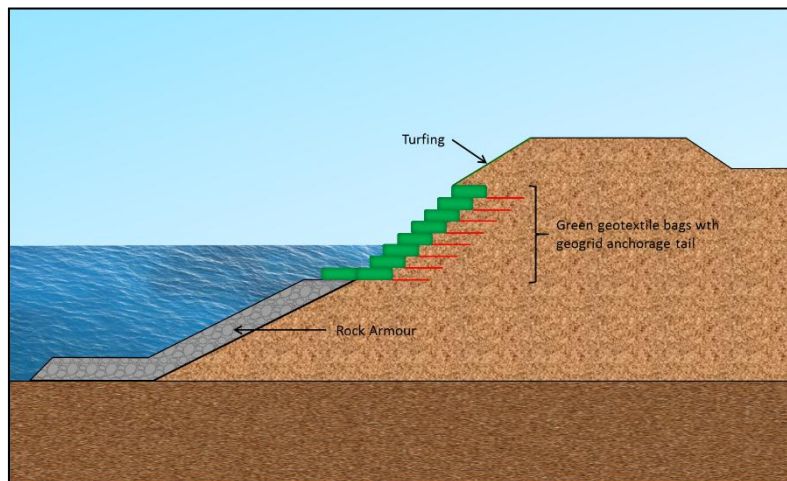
Typical cross section of proposed riverbank erosion protection at Rasau River.
